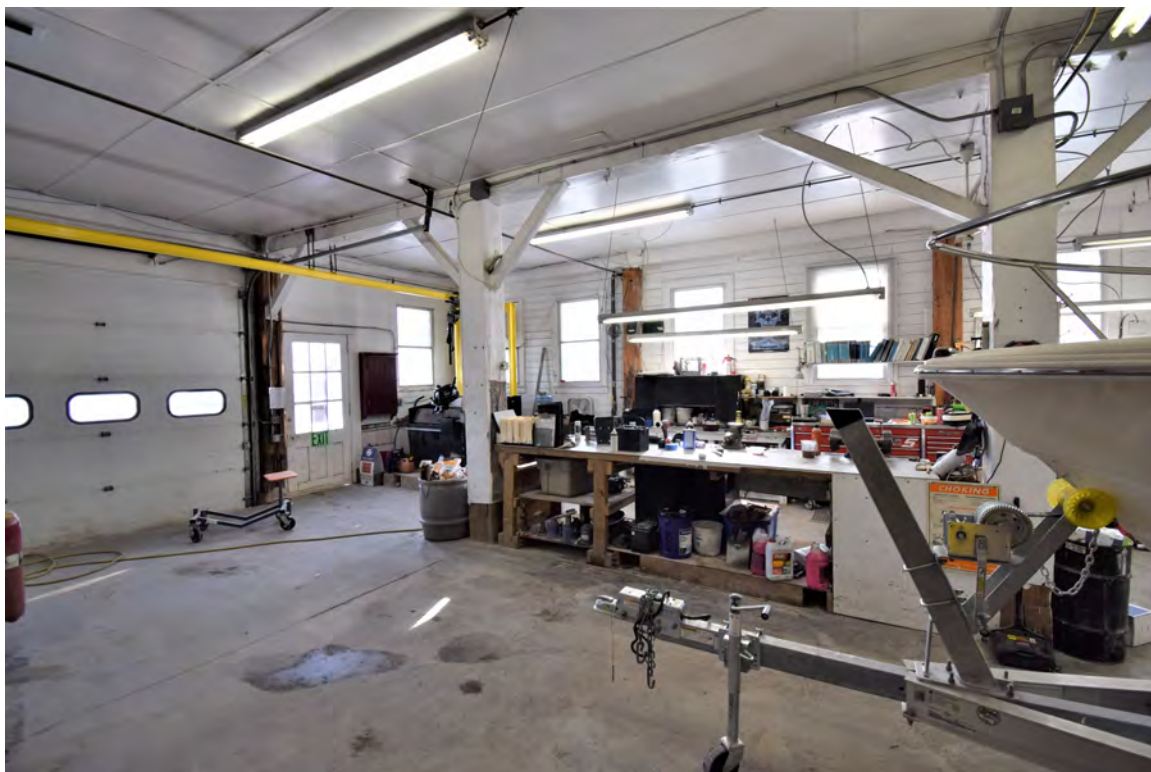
Building #4, view looking south in boat repair shop, southwest side of first floor.
